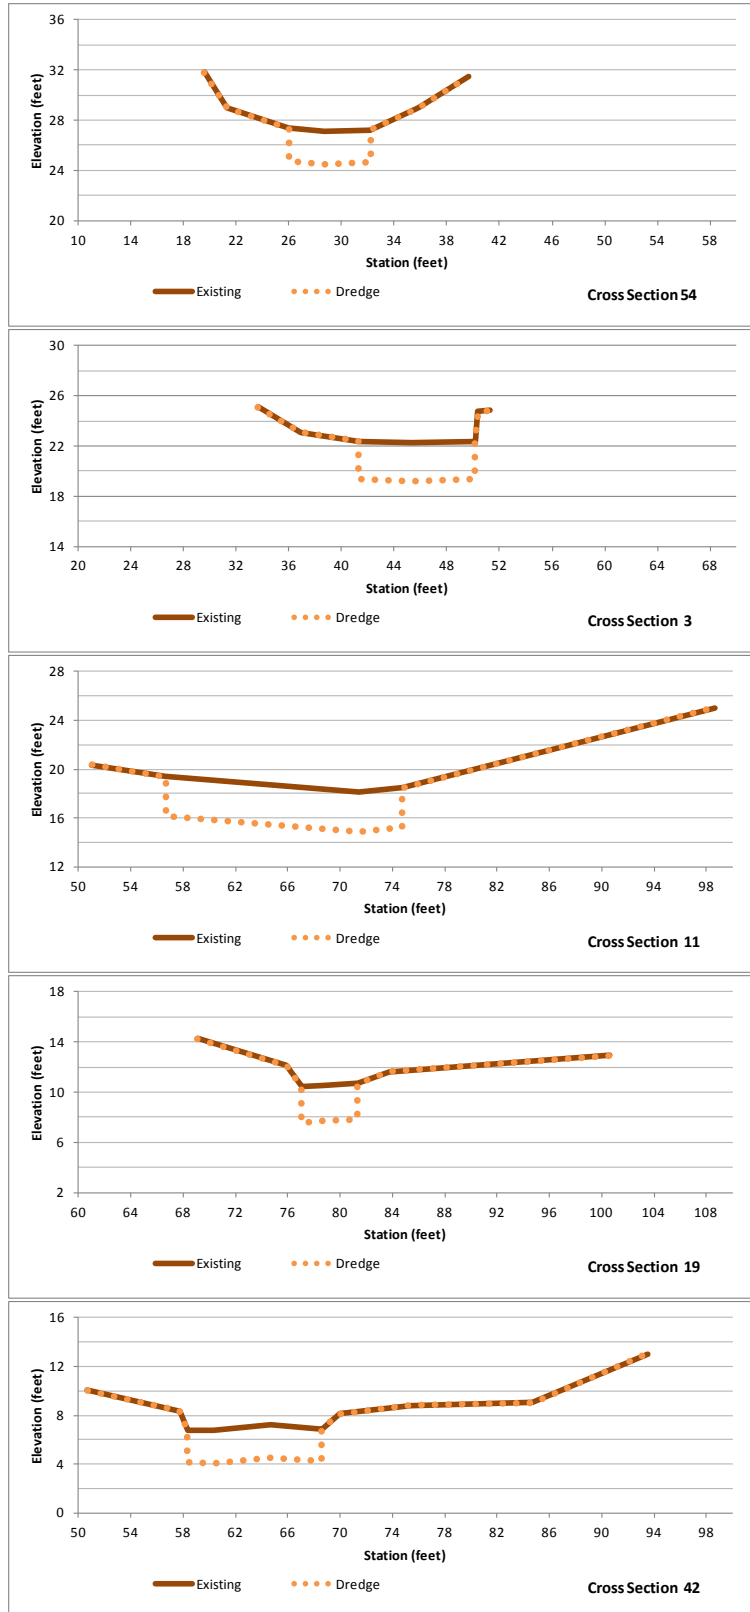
Representative channel cross-sections used in hydraulic model of proposed dredging scenario (locations shown in Figure 11-1).
